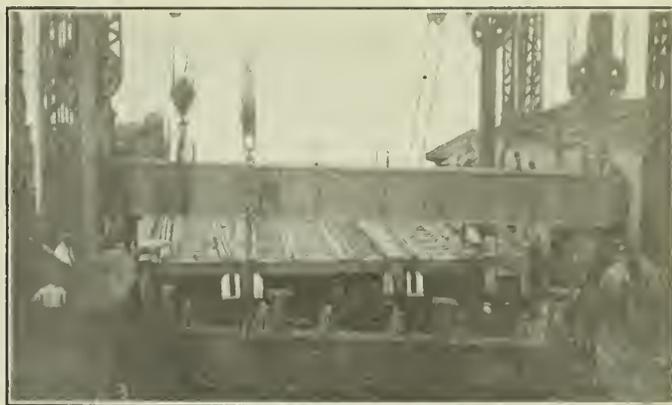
Removing old Girder *E*. New 26-ton Girder suspended from Overhead Gantry.
